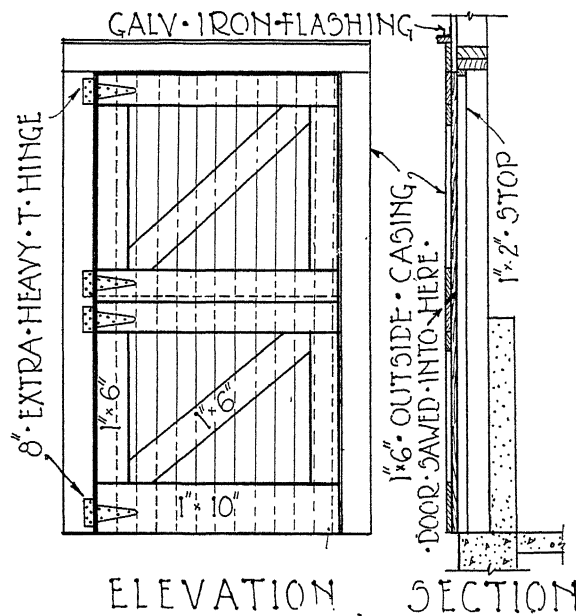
Door details. Door to be made in one piece, hung, and then sawed across the middle, so that it hangs in two sections. Top can be opened for ventilation. This type of door suitable for openings 4 feet or less in width. For wider openings use sliding door.
